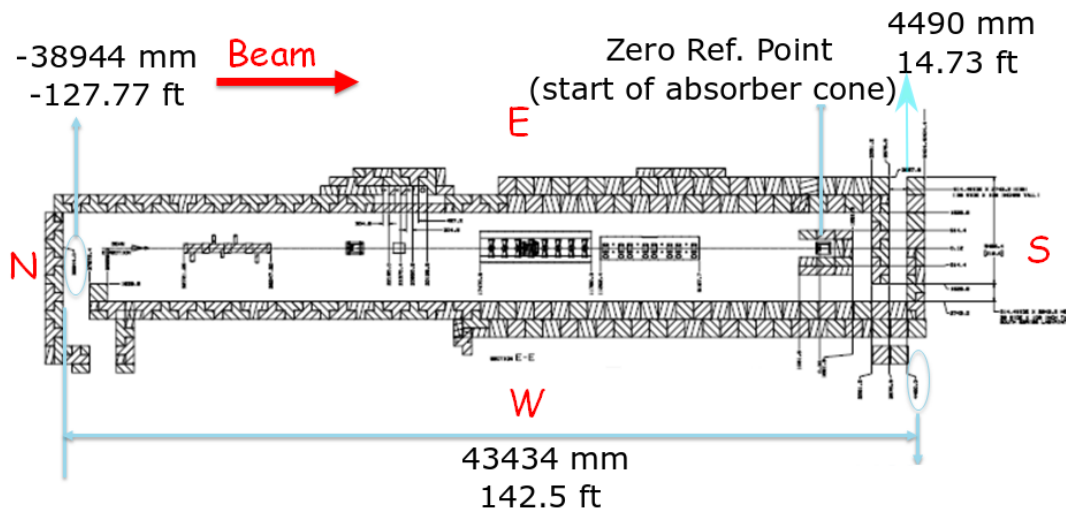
PIP2IT enclosure at beam level (1.3 m from the floor)
